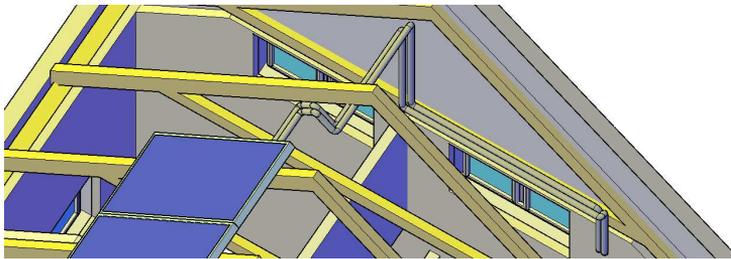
Solar panels on roof construction and pipes conduction at the rafters space
